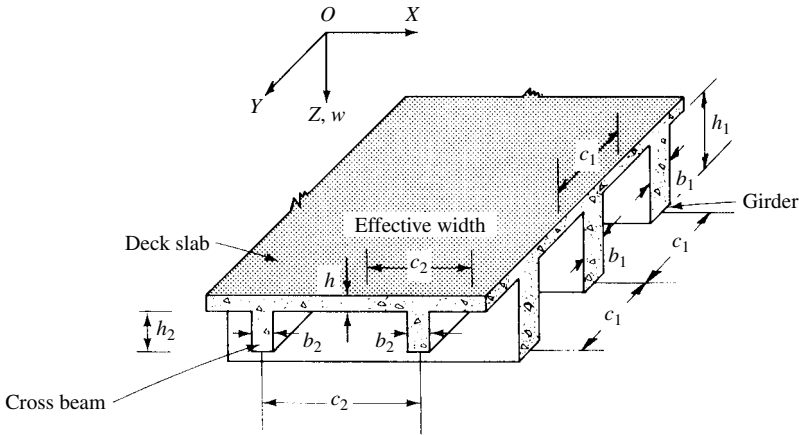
Reinforced-concrete slab stiffened by orthogonal ribs.
